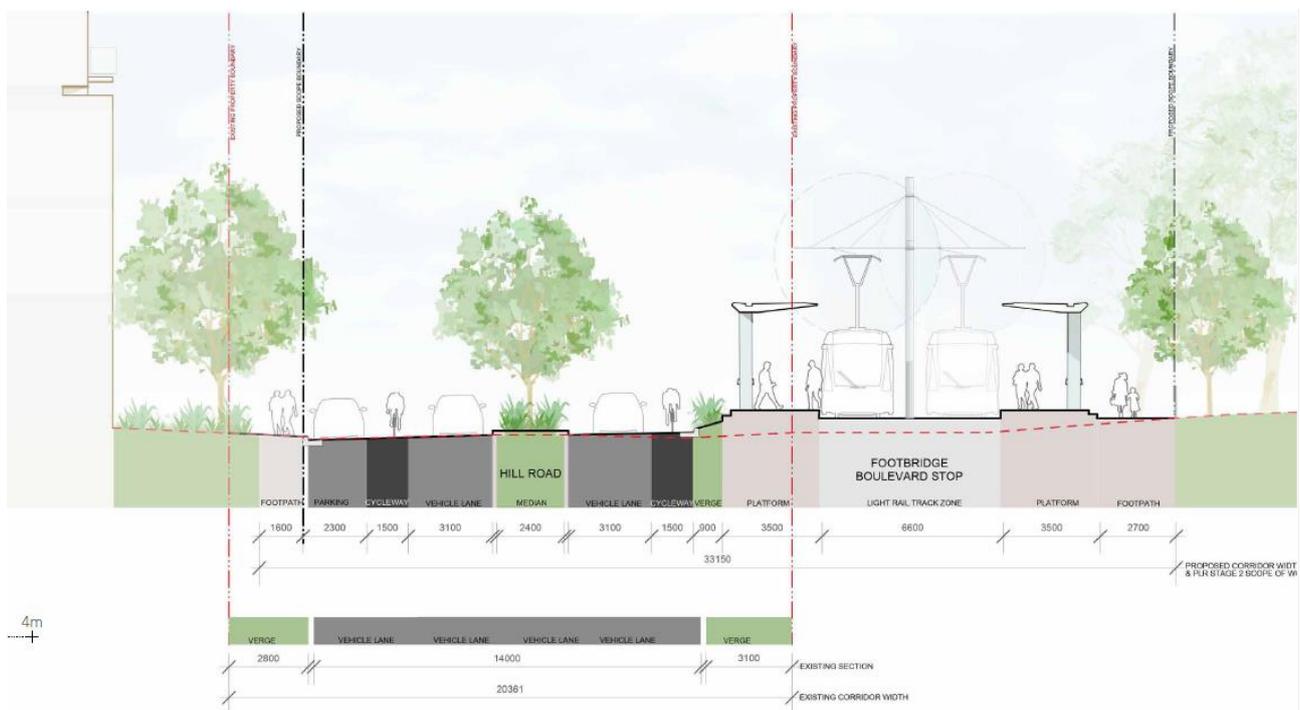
Cross section of Hill Road in Wentworth Point showing existing and proposed allocation of road space (Source: TfNSW / ASPECT Studios)
